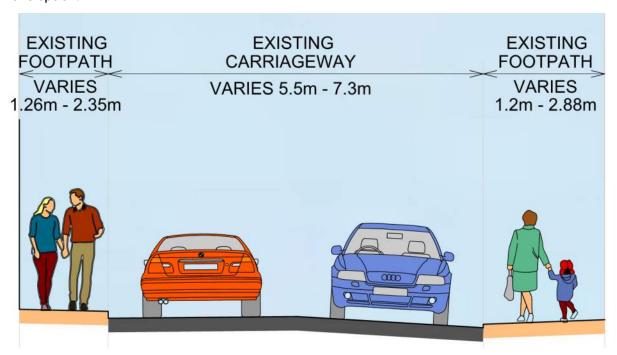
Typical Section 2 Do Minimum Scenario Cross Section South Circular Rd
